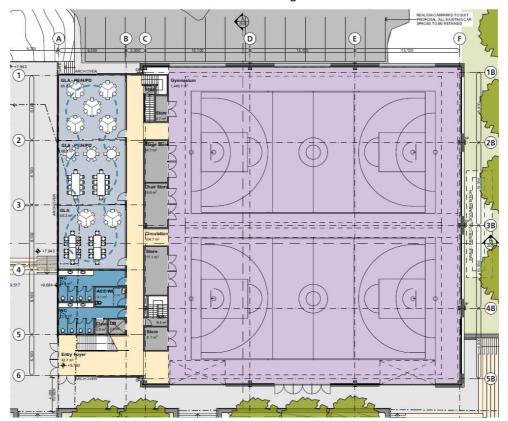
Plan of the MPC Ground Floor showing the GLA's, Courts and facilities. (SHAC Sheet 3002)
